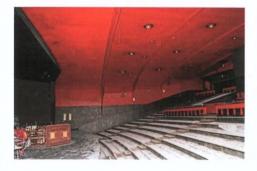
T-2 – Former balcony; view to north NO PHOTO KEY
